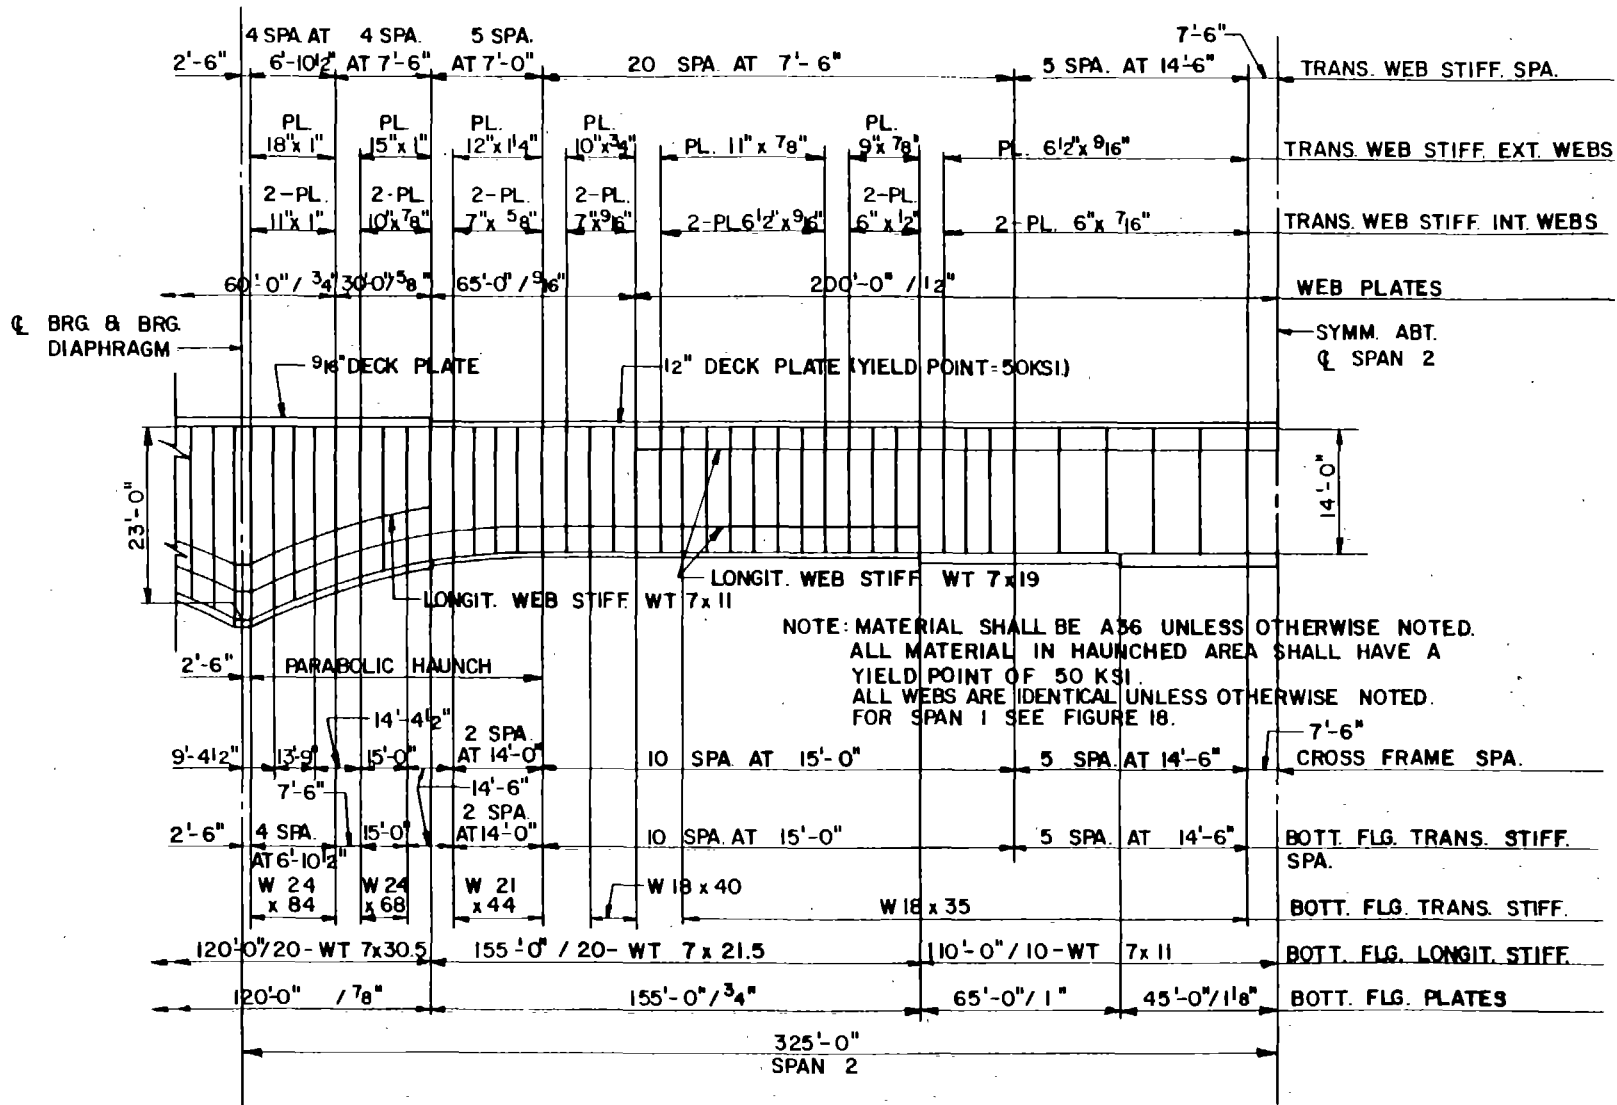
INTERIOR ELEVATION OF GIRDER WEB - PROPOSED SPECIFICATION - LONG SPAN
